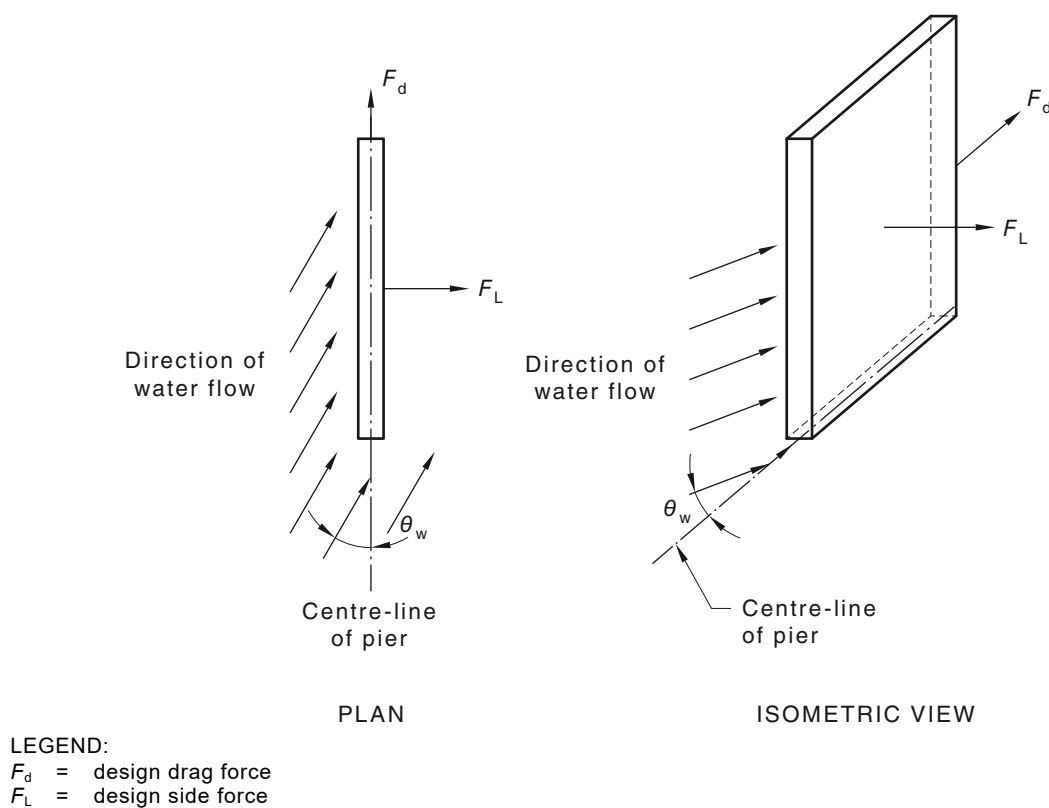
DRAG AND SIDE FORCES ON PIERS
